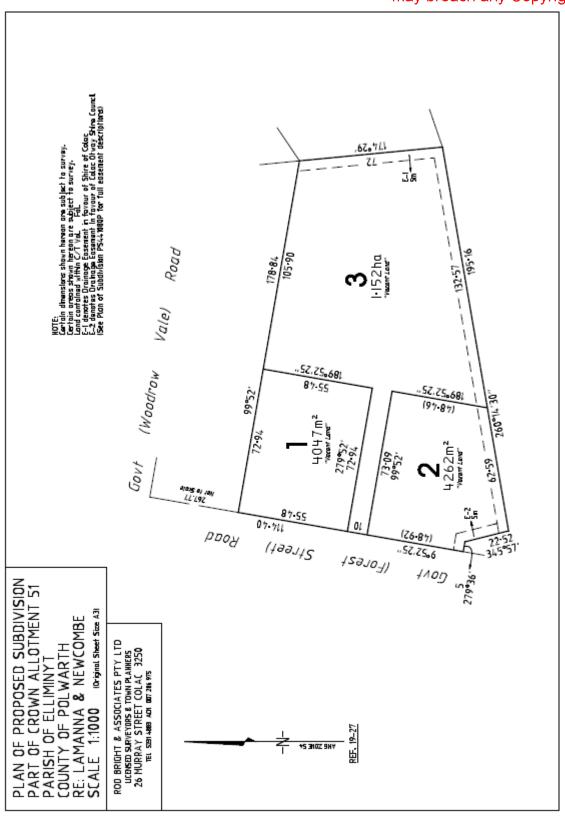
Proposed plan of subdivision (Rod Bright & Ass.)
